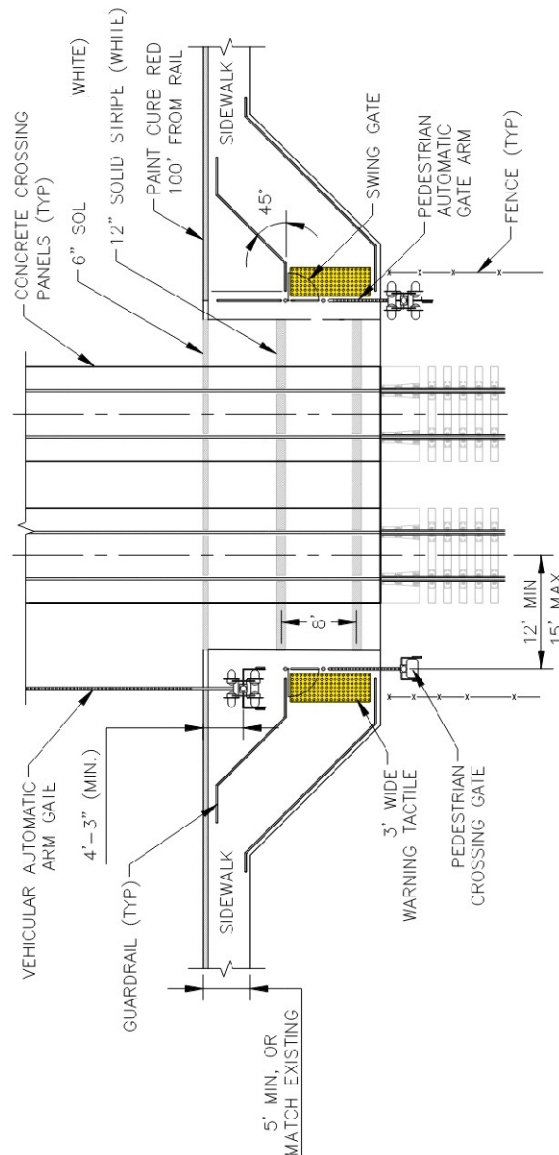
Typical Pedestrian Sidewalk at Vehicular Crossing
